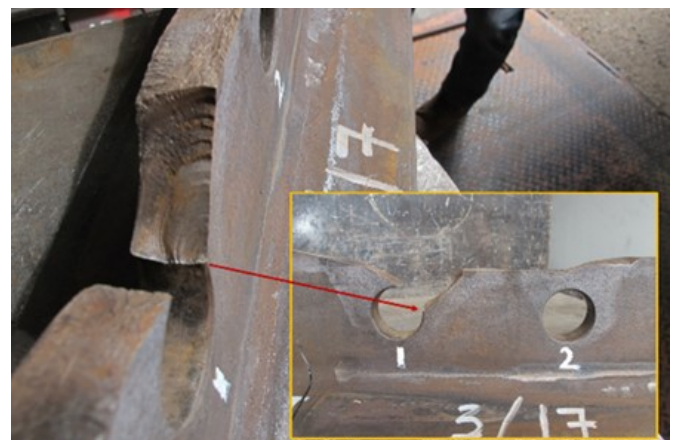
Fatigue crack initiation at bolt hole 1, NE corner
